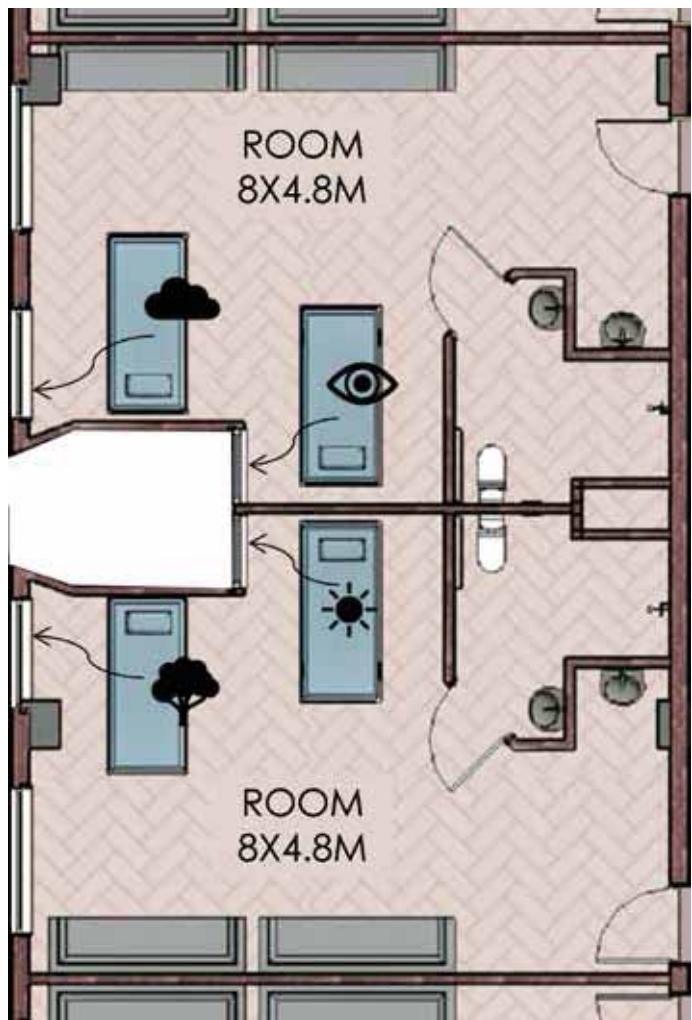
Rooms on 10th and 11th Floor Plan - splayed walls ensure both patients enjoy open views and natural light
